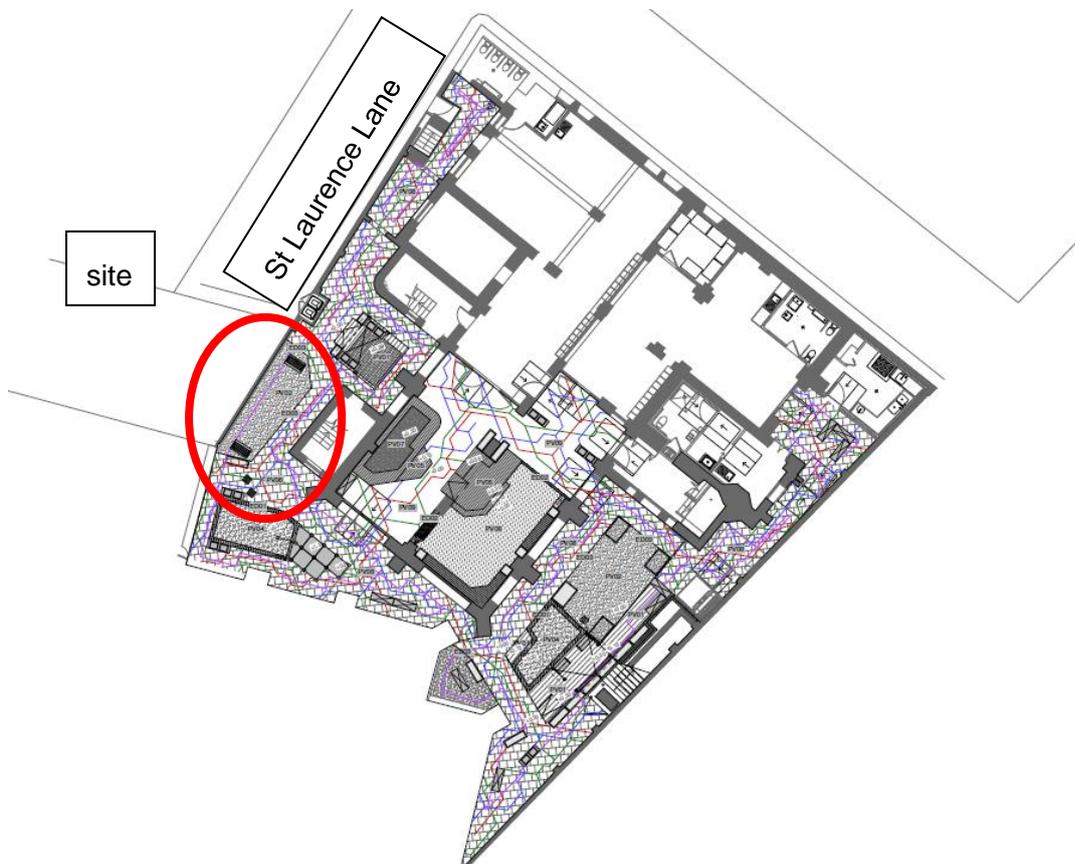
The approved ground floor layout of the childcare centre, with the open space highlighted adjoining the rear of the subject site
